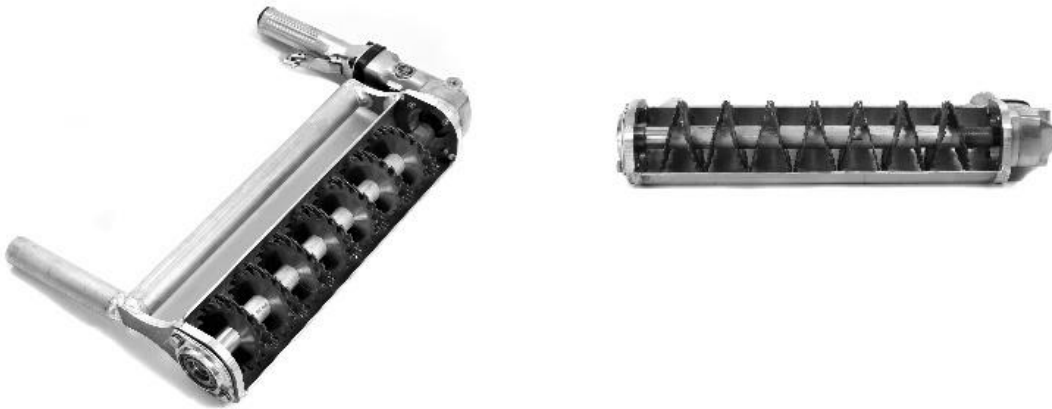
Scarifier with carbide cutting wheels (air driven)
